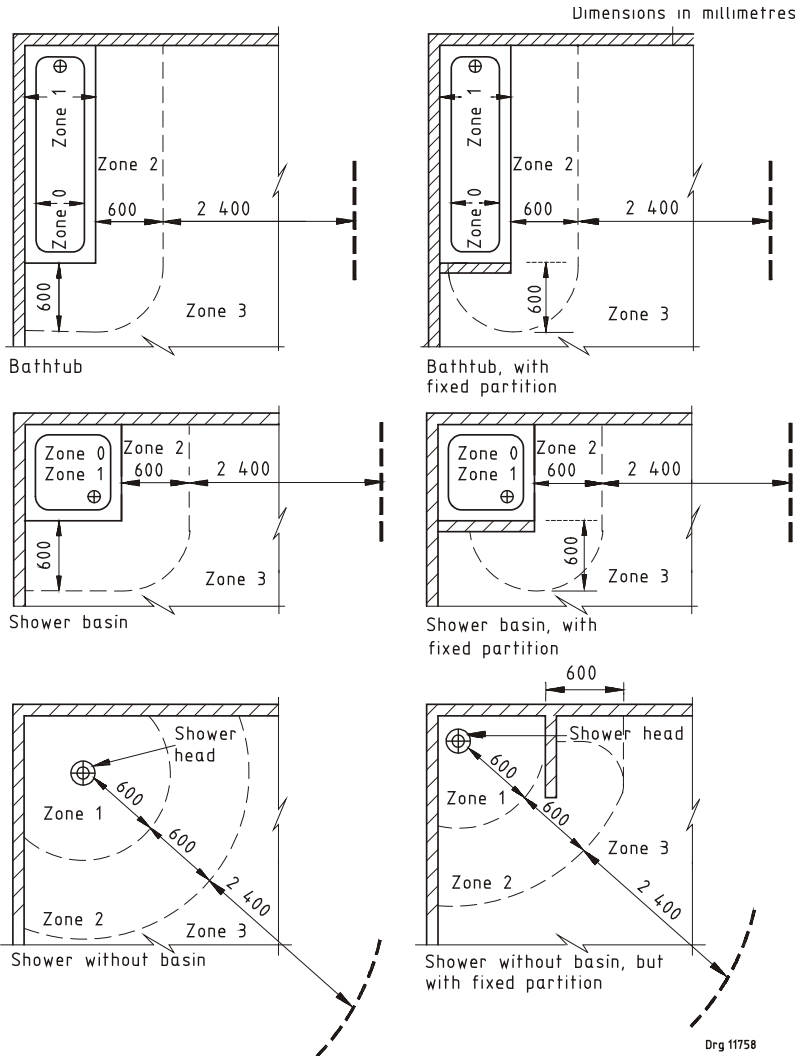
Plan of zone dimensions for bathrooms
